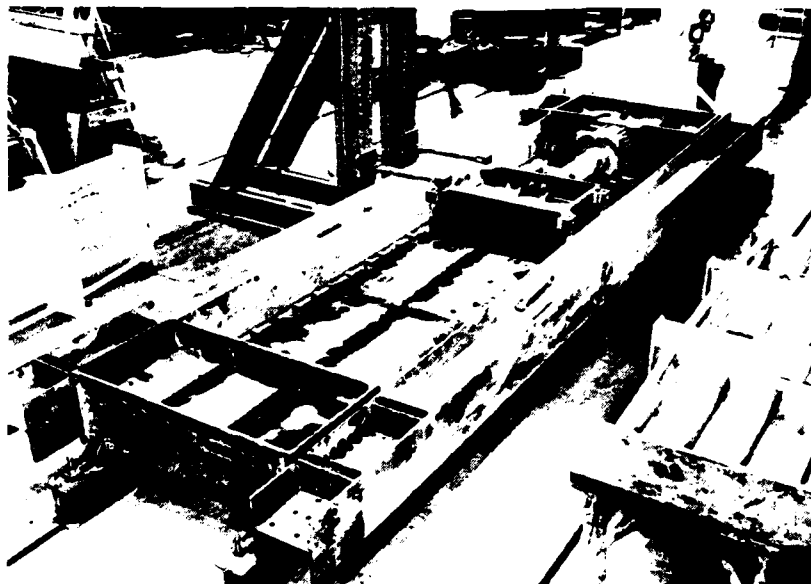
(790426-3) Load/Reaction Frame Setup for Three-Bay Element Tests
